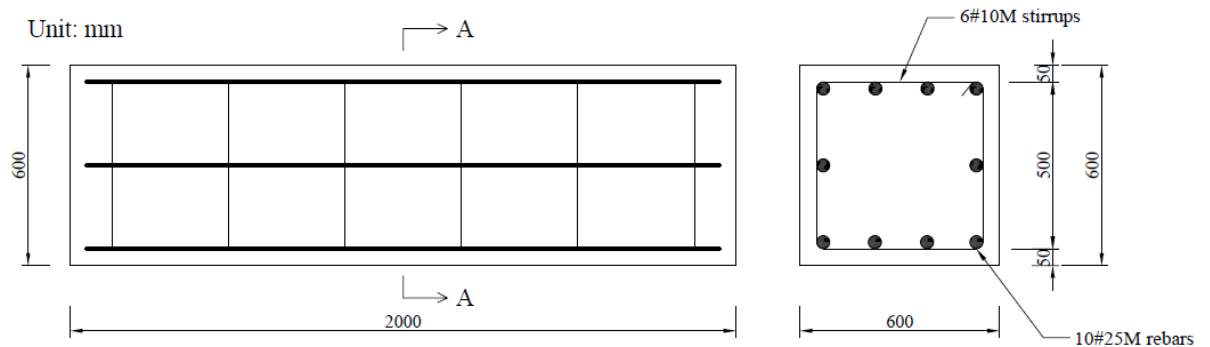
Dimensions and reinforcement configuration of RC beams.
